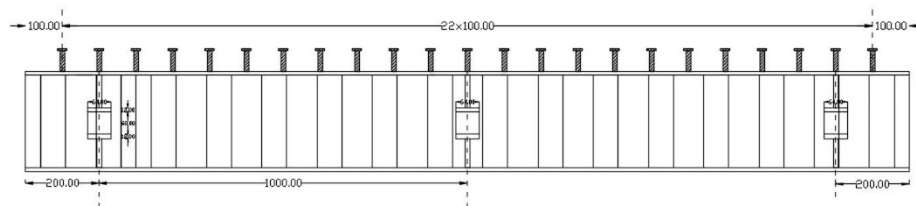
Elevation view of the beam connections of the girder with corrugated steel webs (mm).
